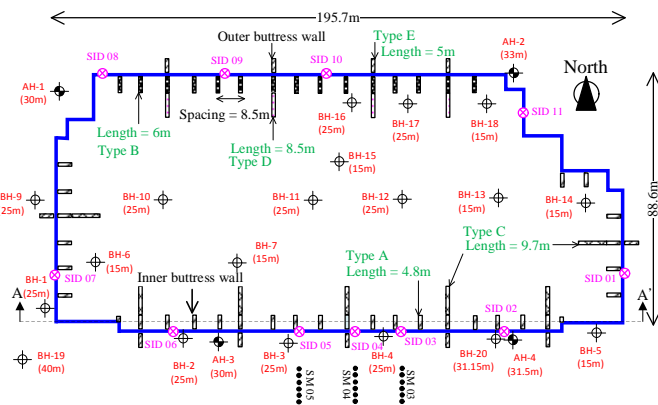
A strut free excavation system by combination of different shapes of buttress walls
